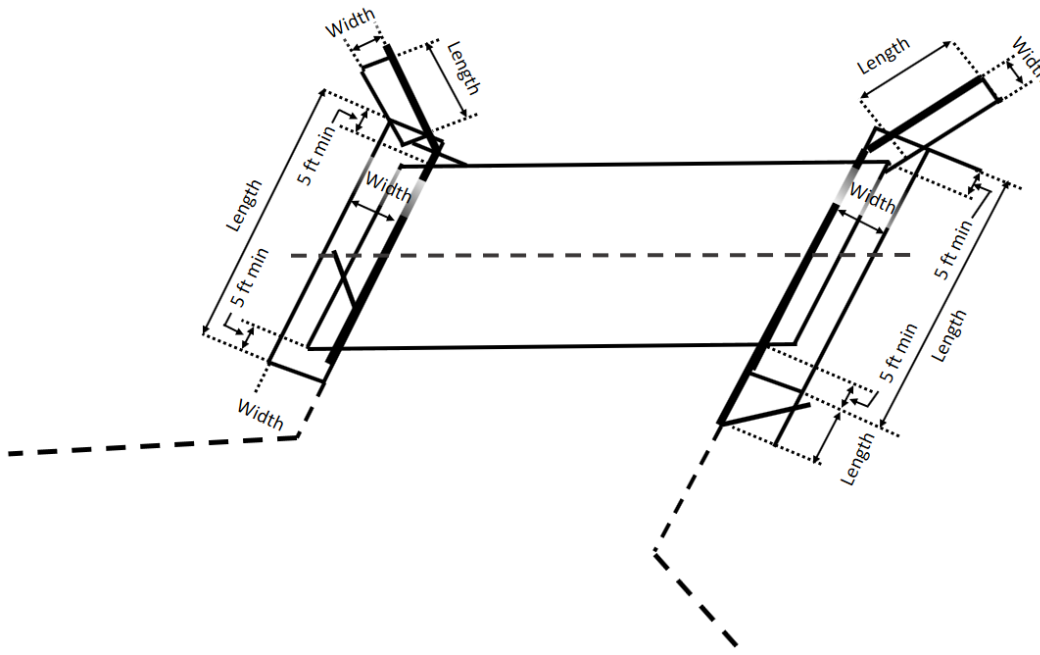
Illustration. Abutment face view, cross section, and footprint.
